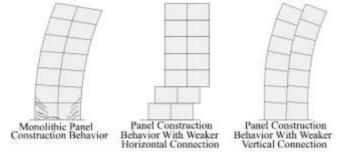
Precast concrete panel construction behavior (Paksoy, 1993)
